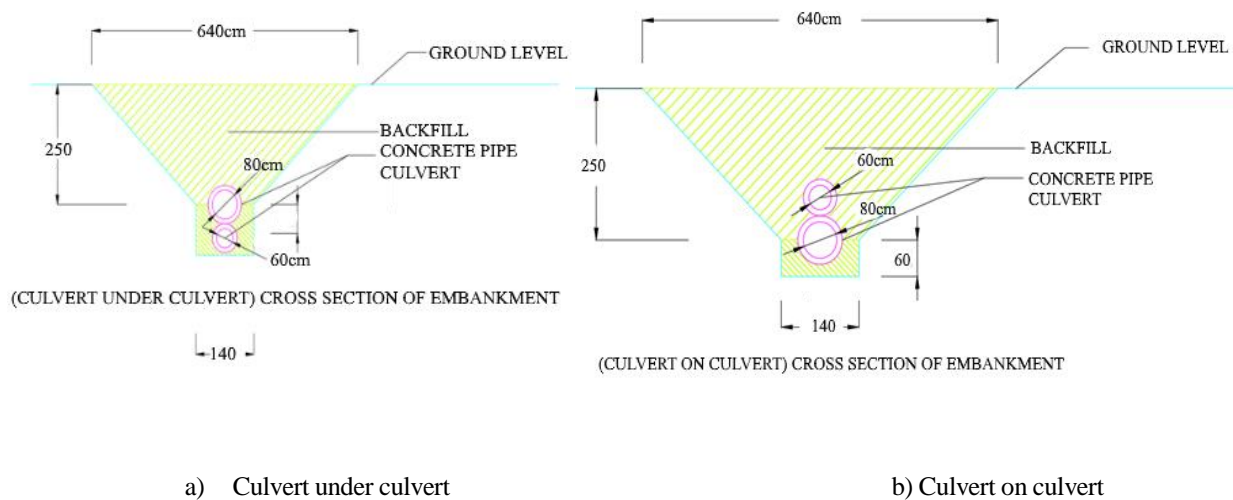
Cross-section of the culvert systems below(a)-above(b) the culvert
